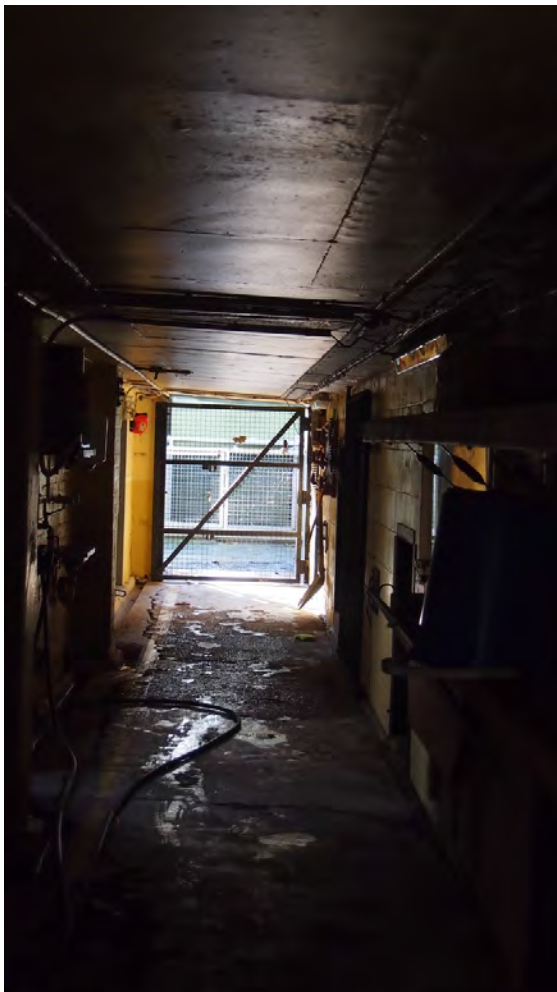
Within the tunnel and looking back at the entrance to the tunnel.
